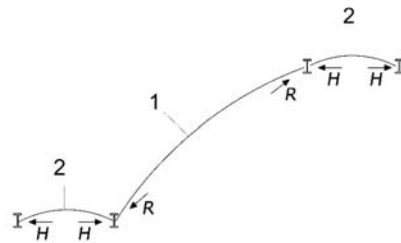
Calculation scheme of masonry stairs with segmental vault and arched staircase slab: 1—arched staircase slab; 2—landings.
